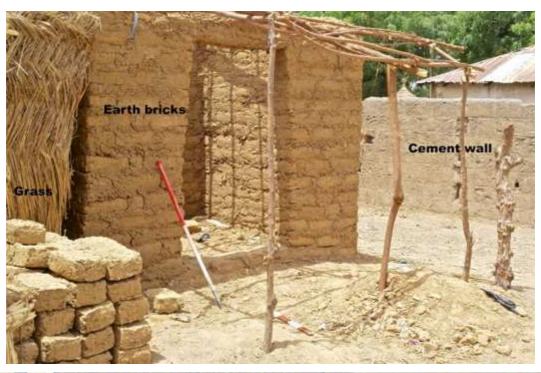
Additional form of building and materials used in the society (mud and concrete bricks).
